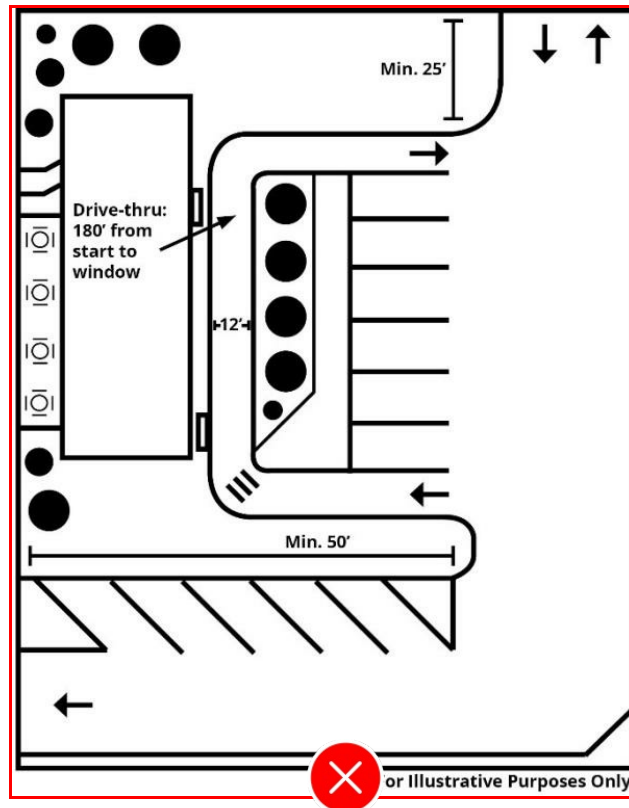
(2) Drive-thru Facility with Front Drive Aisle
